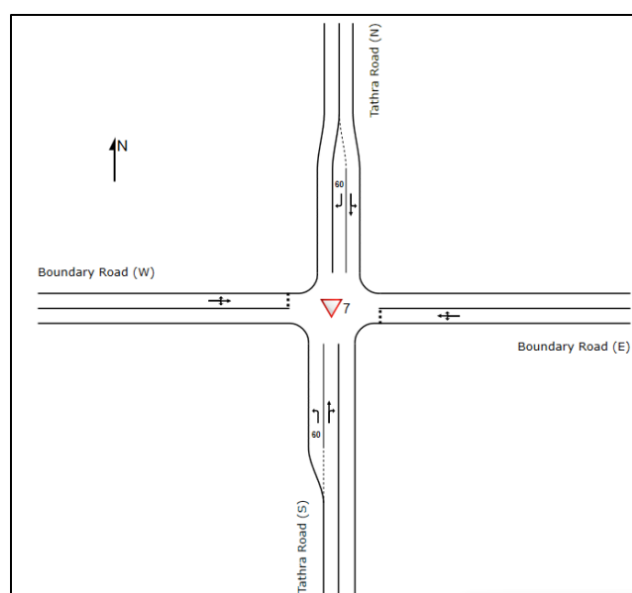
Tathra Road and Boundary Road intersection layout (source: GHD, 2025)
